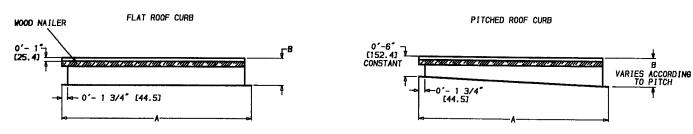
Dedicated Small-Cabinet Roof Curb Dimensions
